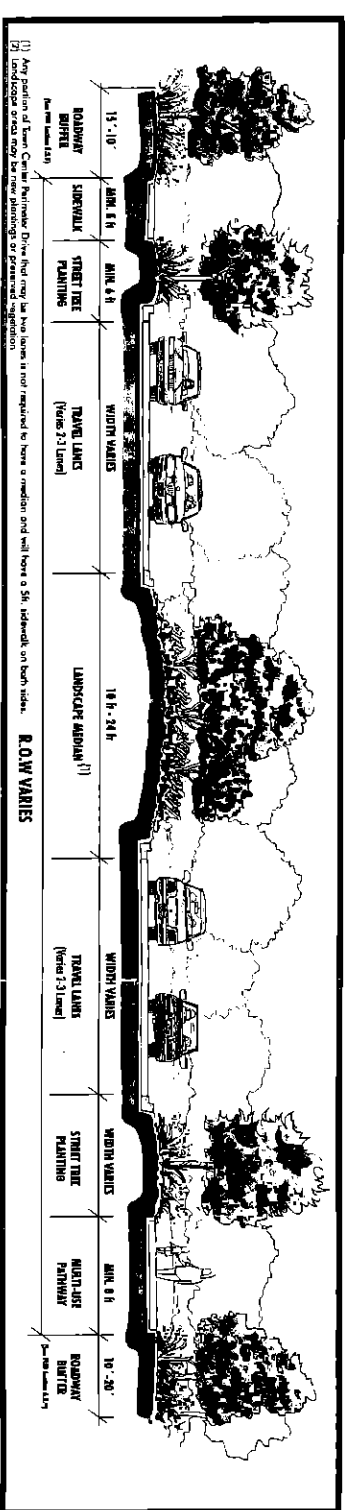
TOWN CENTER PERIMETER DRIVE, CROSSWATER PARKWAY and SNOWDEN PARKWAY TYPICAL SECTION
